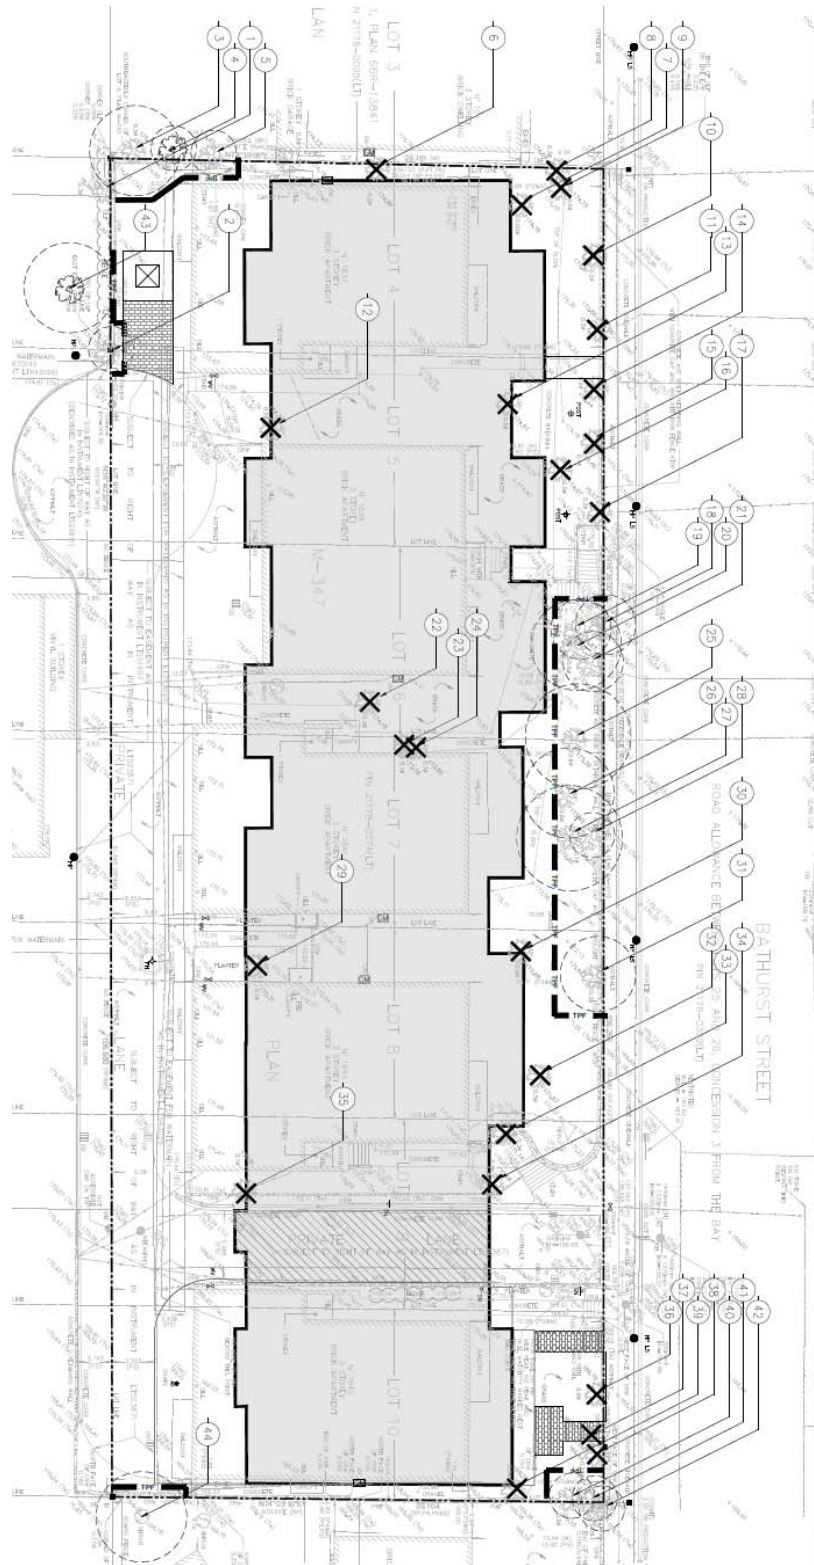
Tree locations on the 1637 to 1645 Bathurst Street development site
